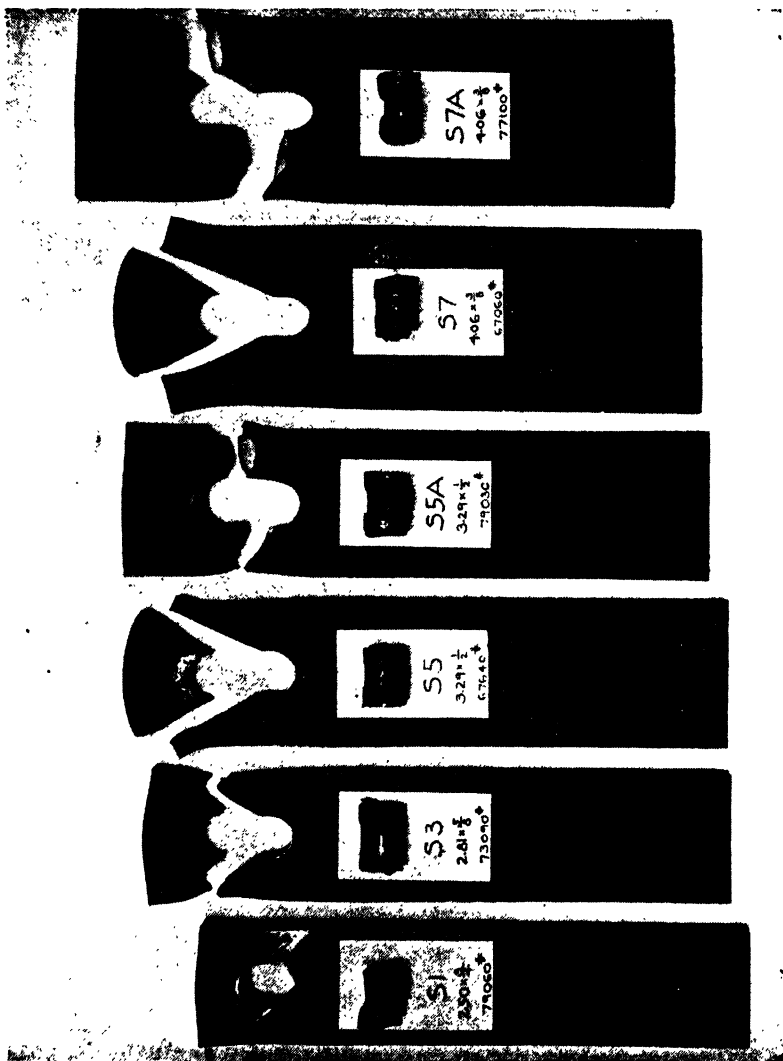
FAILURES OF RIVETED TEST SPECIMENS.
